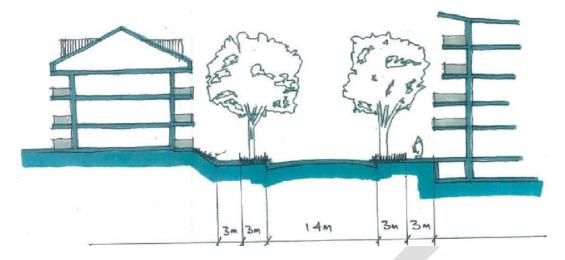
Building Type A and B building as viewed from Broughton Street
